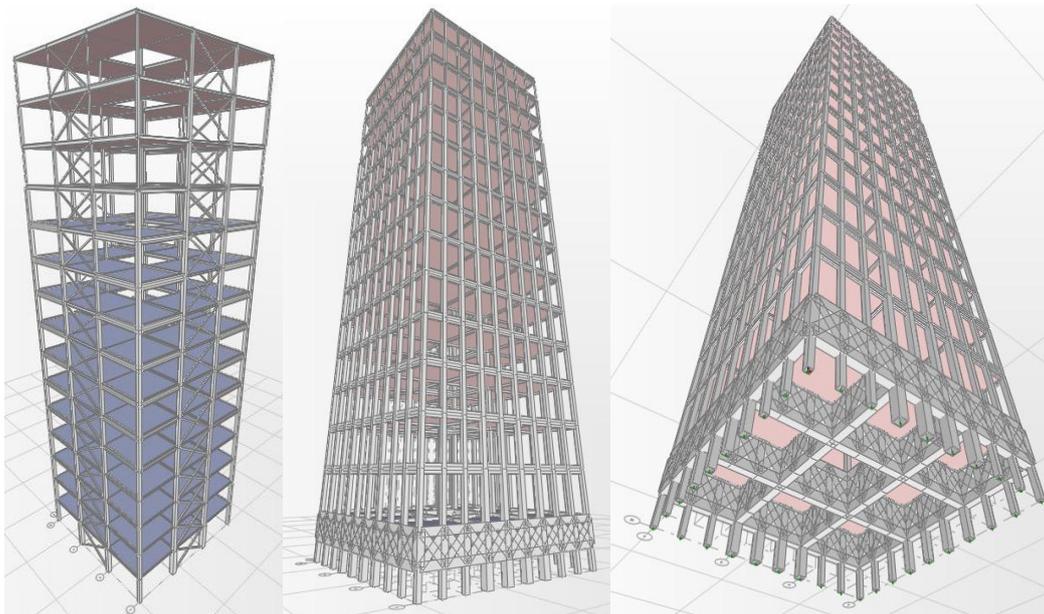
Overall views of 15-story ordinary building (left) and its rocking counterpart with tubular frame system (middle) and the bottom view of the rocking building showing the grid of deep girders (GDG) at its lowest story
